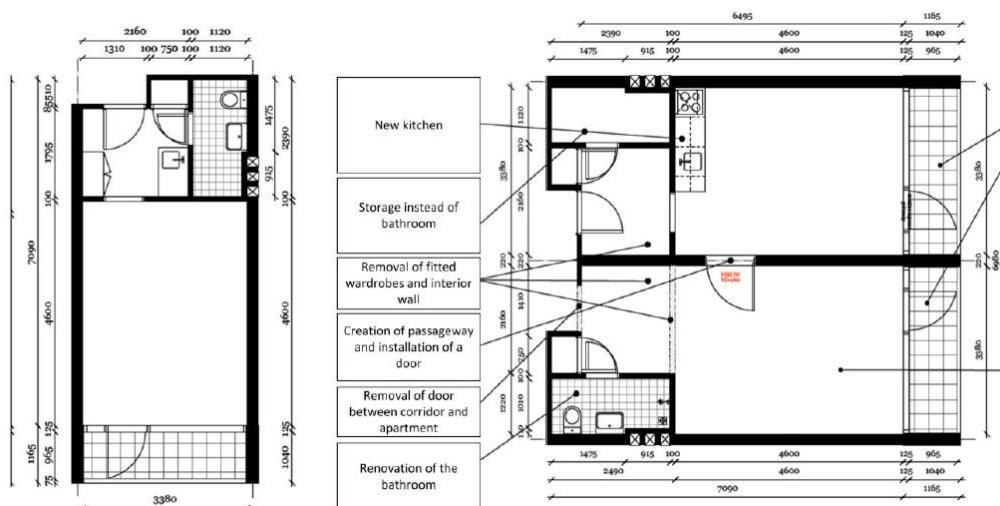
One room floor plan (left) before the transformation to two-room apartment (right) (Van Hoof & Boerenfijn, 2018).
